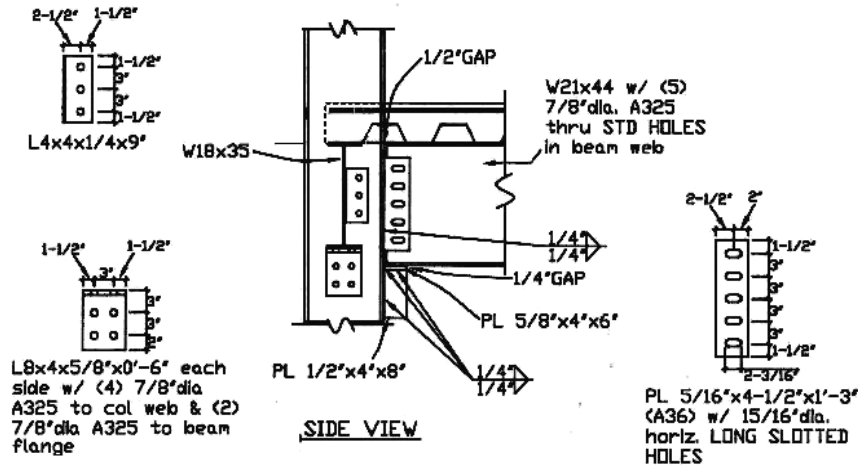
Beam-to-Column Connections in Longitudinal Direction (Astaneh-Asl et al., 2001a)
